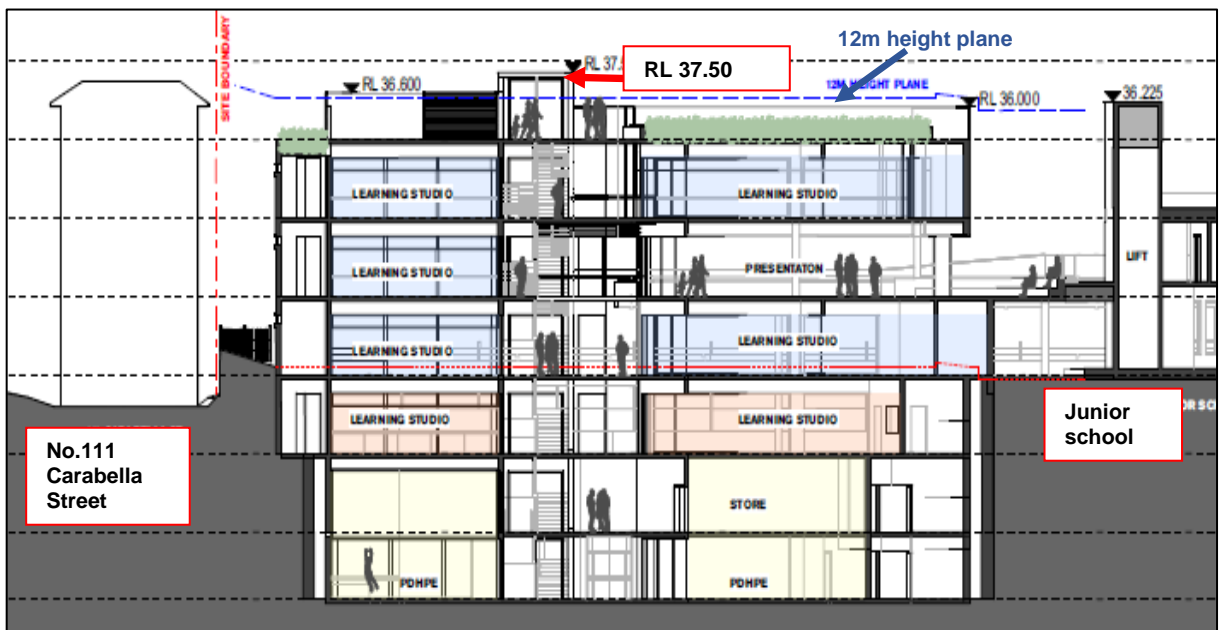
Section through the learning hub and adjoining buildings (Stage 1)
